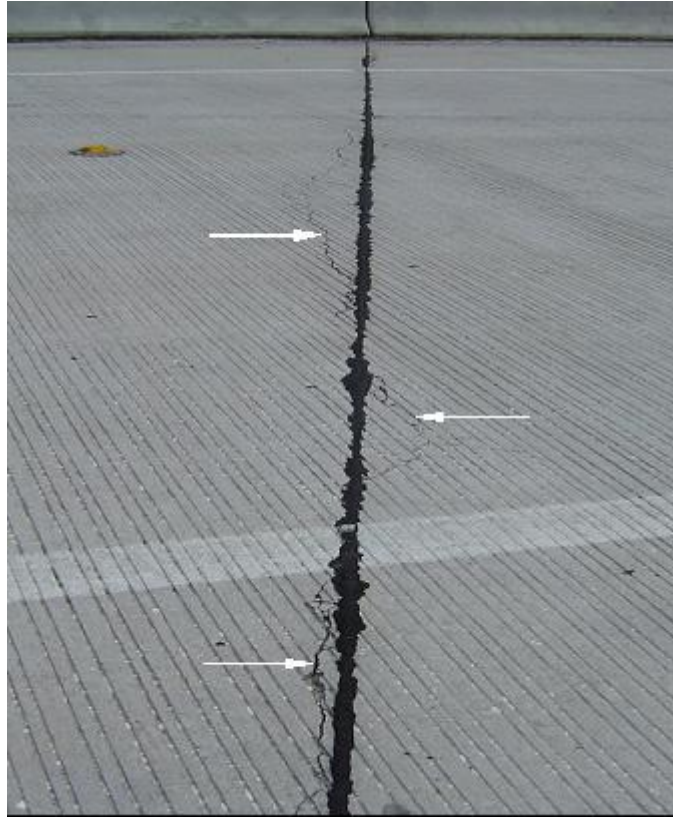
Transverse cracks at a control joint on the Cow Creek Bridge
